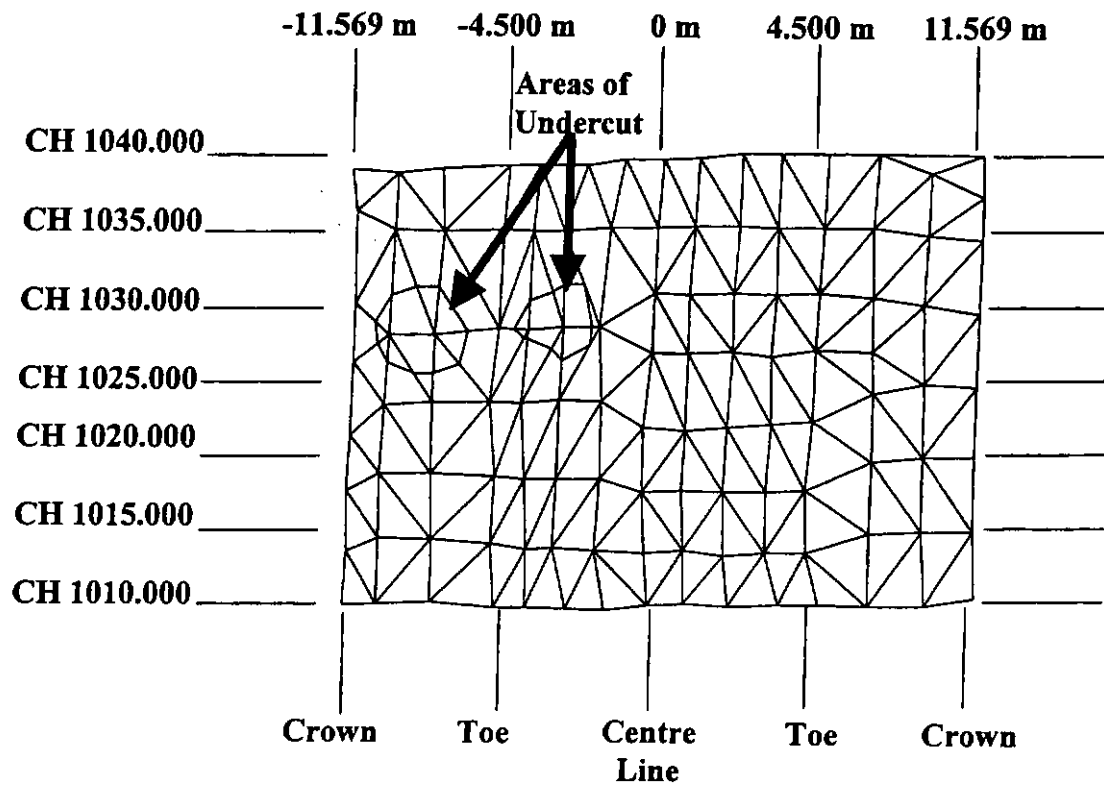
TIN surface developed on plan view for site inspection and removal of undercut areas in a construction project.
